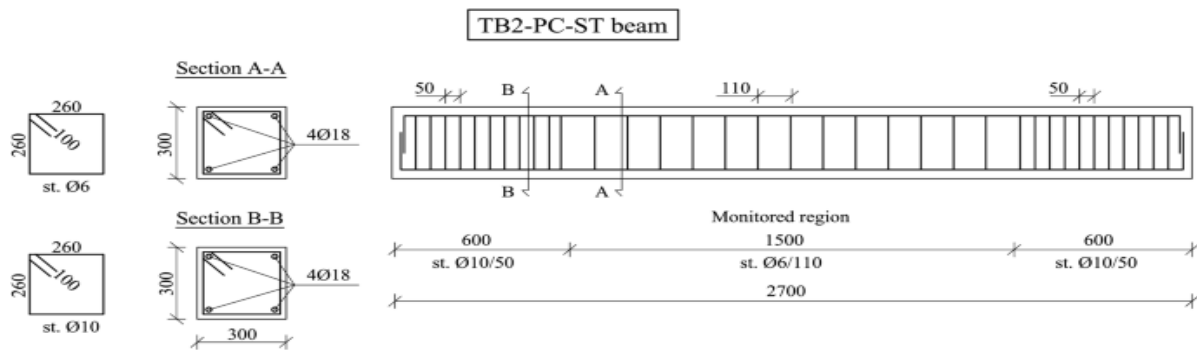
Longitudinal spacing and transversal spacing of a beam.
